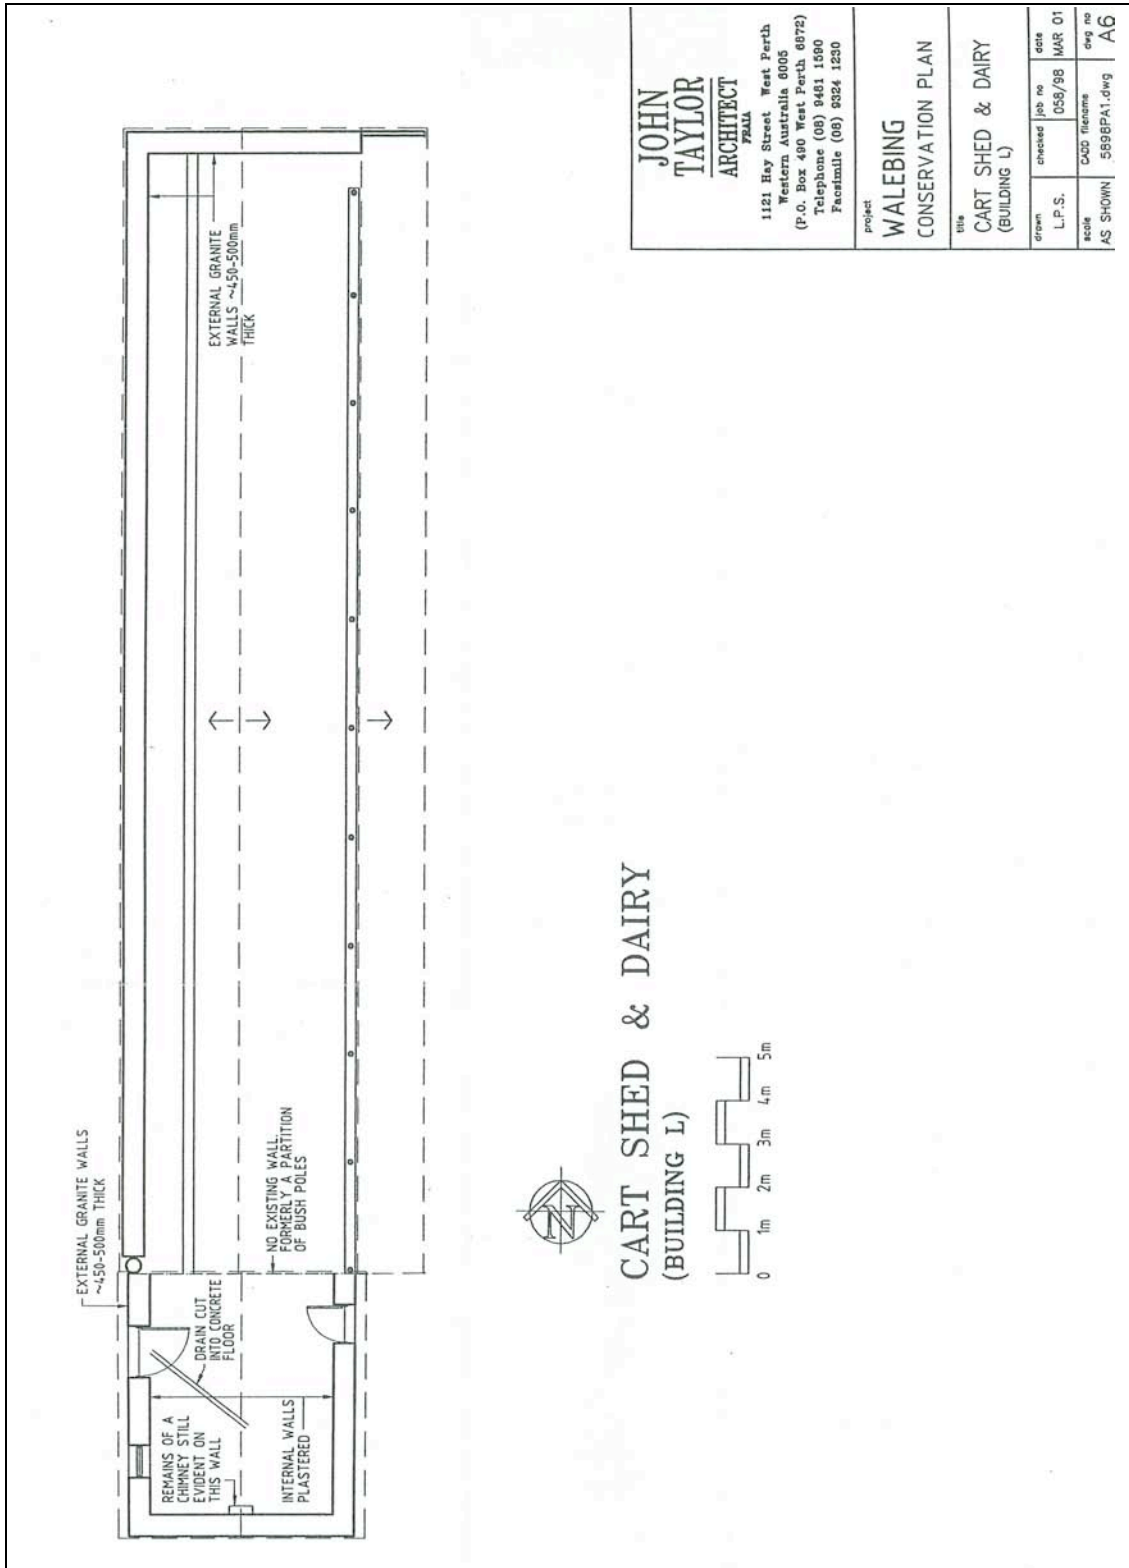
Plan of Cart Shed and Dairy from John Taylor 2001 (reproduced with permission of John Taylor)
